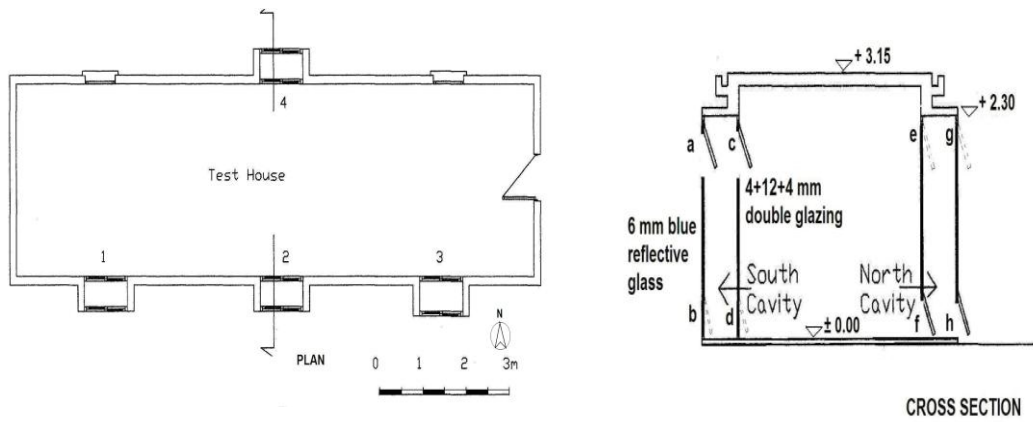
Plan and Cross Section of the Test House (B.Ozdeniz, and Alibaba, 2010: 4).
